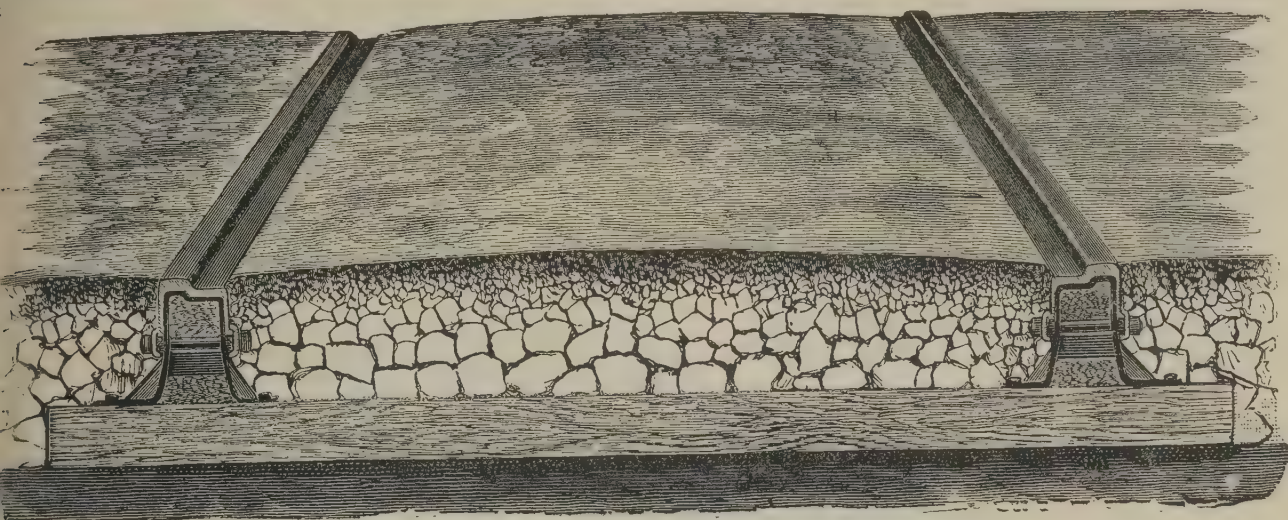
BOX GIRDER RAIL IN MACADAM PAVEMENT.
